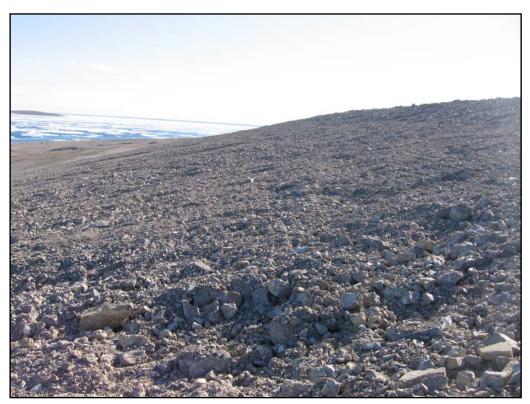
Northing: 8367368 Easting: 558792 Elevation: 33 m. Operational landfill slope; facing southwest
